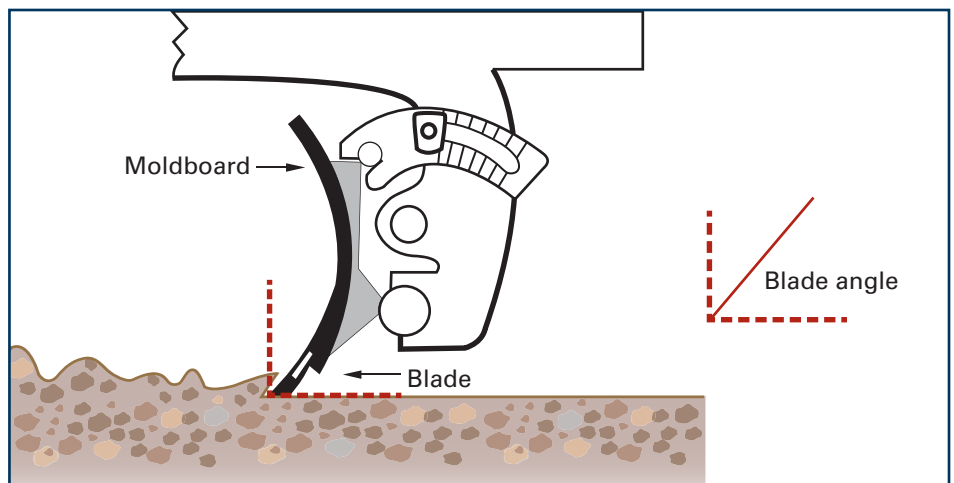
Moldboard tilted backward for heavier grading or more aggressive cutting
